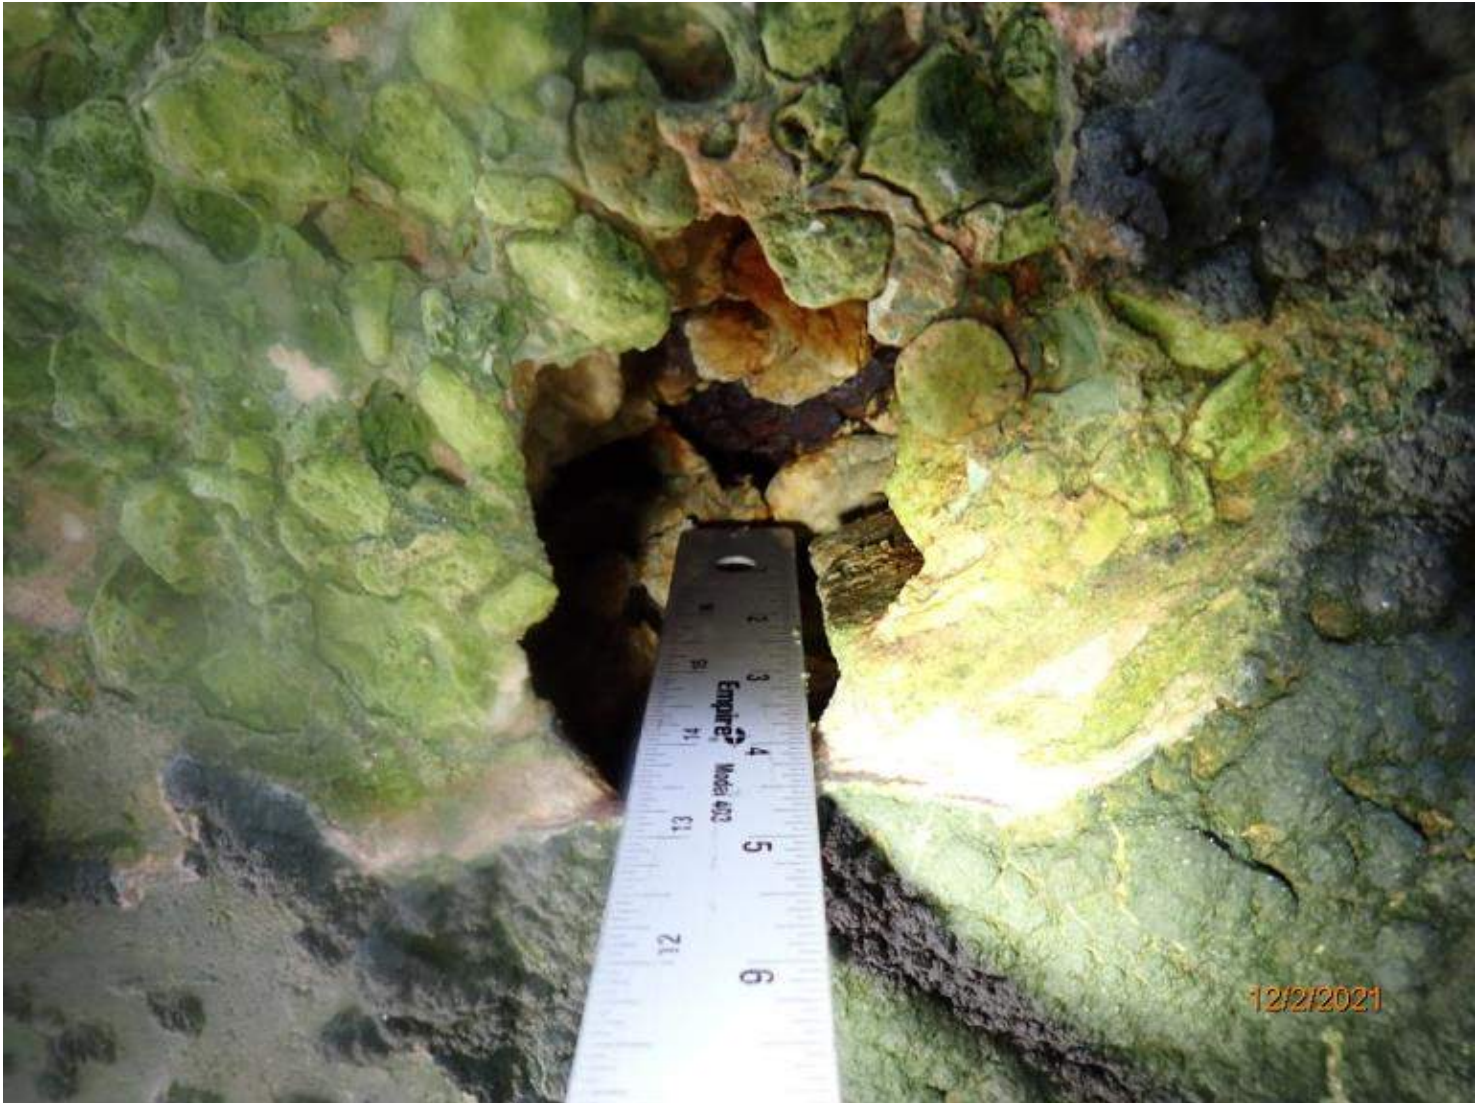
Element 220 Re Conc Pile Cap/Ftg
